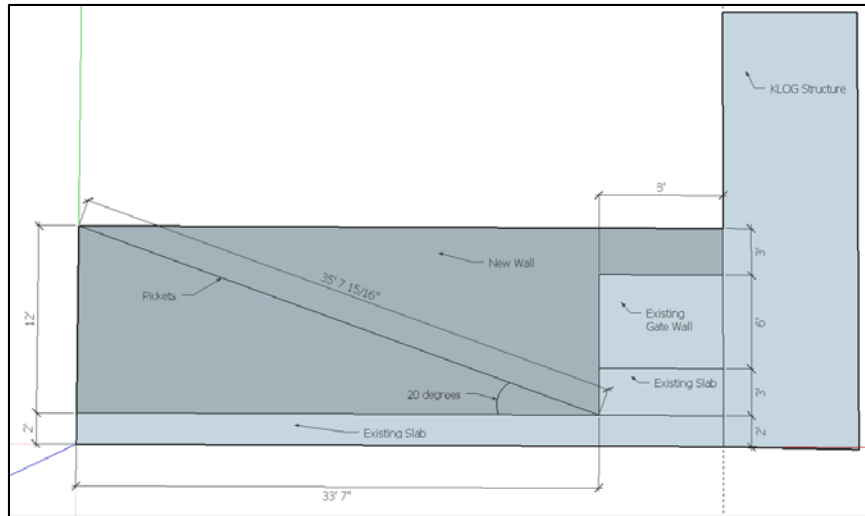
Side view and dimensions of features on the downstream side of KLOG with two raised side walls, the concrete bullnose removed, and a picket weir at the base of the existing gate wall slab.
